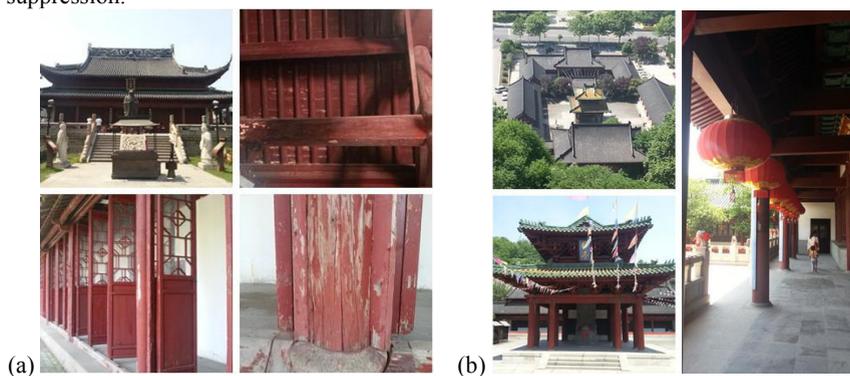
(a) Wood-frame Hall in Confucius Temple. (b) Cloister Layout in Tianfei Palace
